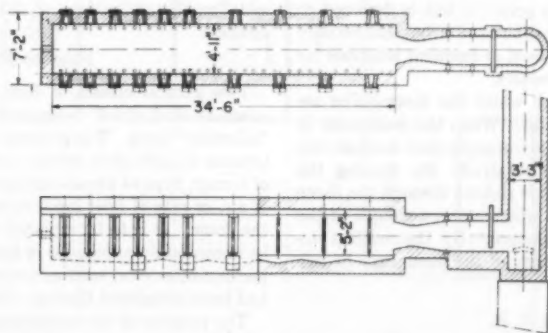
PLAN AND SECTIONAL ELEVATION OF PULVERIZED-COAL FURNACE
